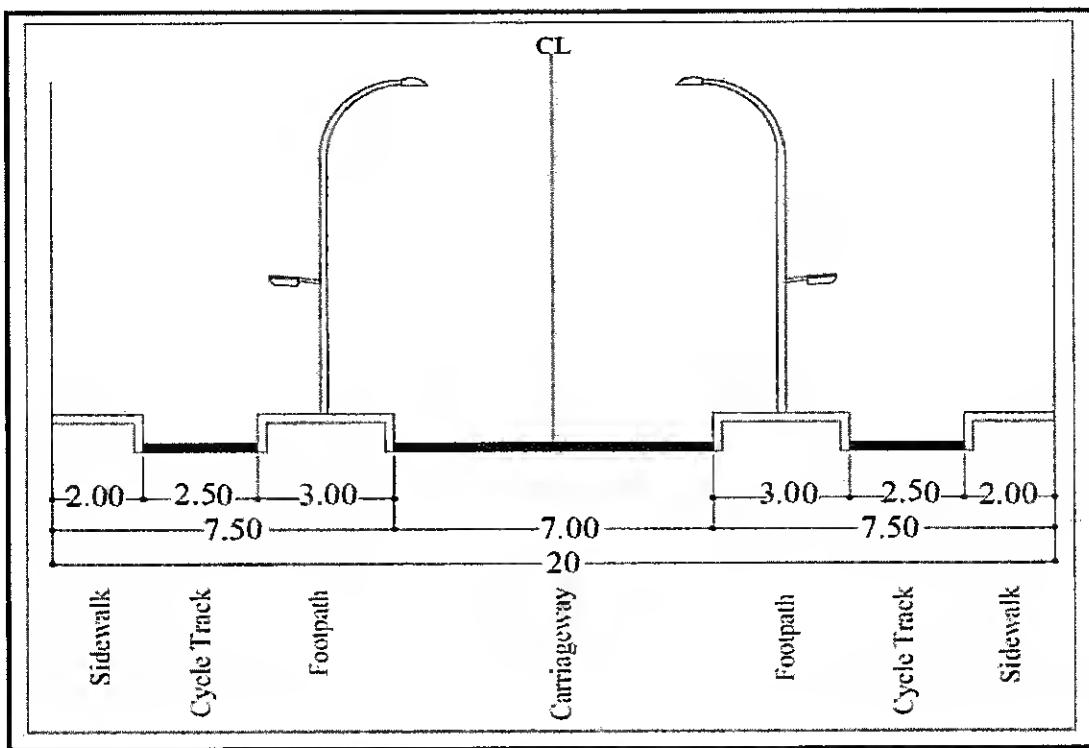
Typical Cross Section for Sub-Arterial Road- Rolling Terrain
